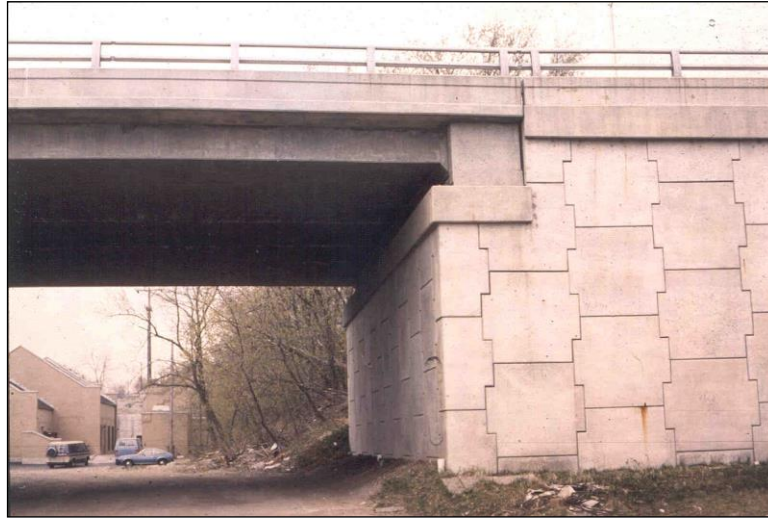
Sill Abutment and MSE Wall
